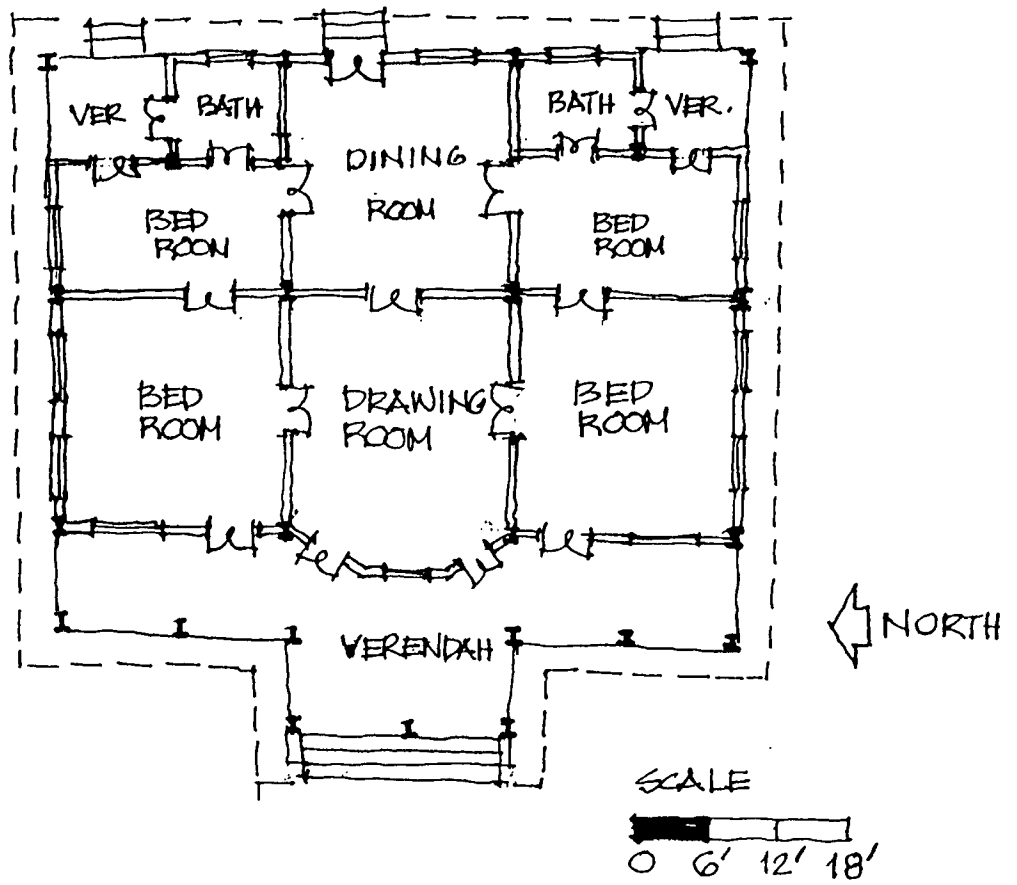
Ground floor plan, Railway bungalow, 15 college street, Dhaka
